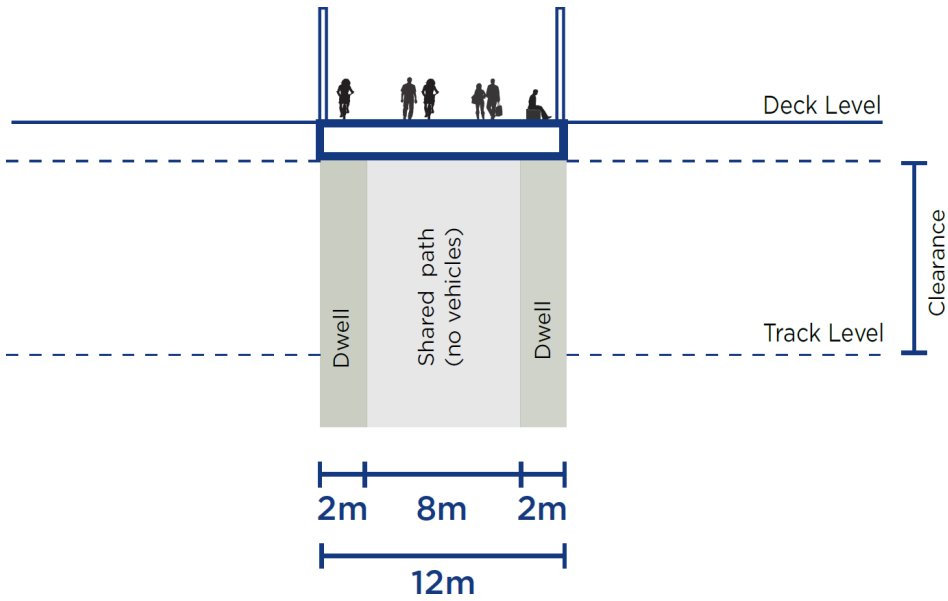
Typical cross-section 9, Prince Alfred Park Bridge
